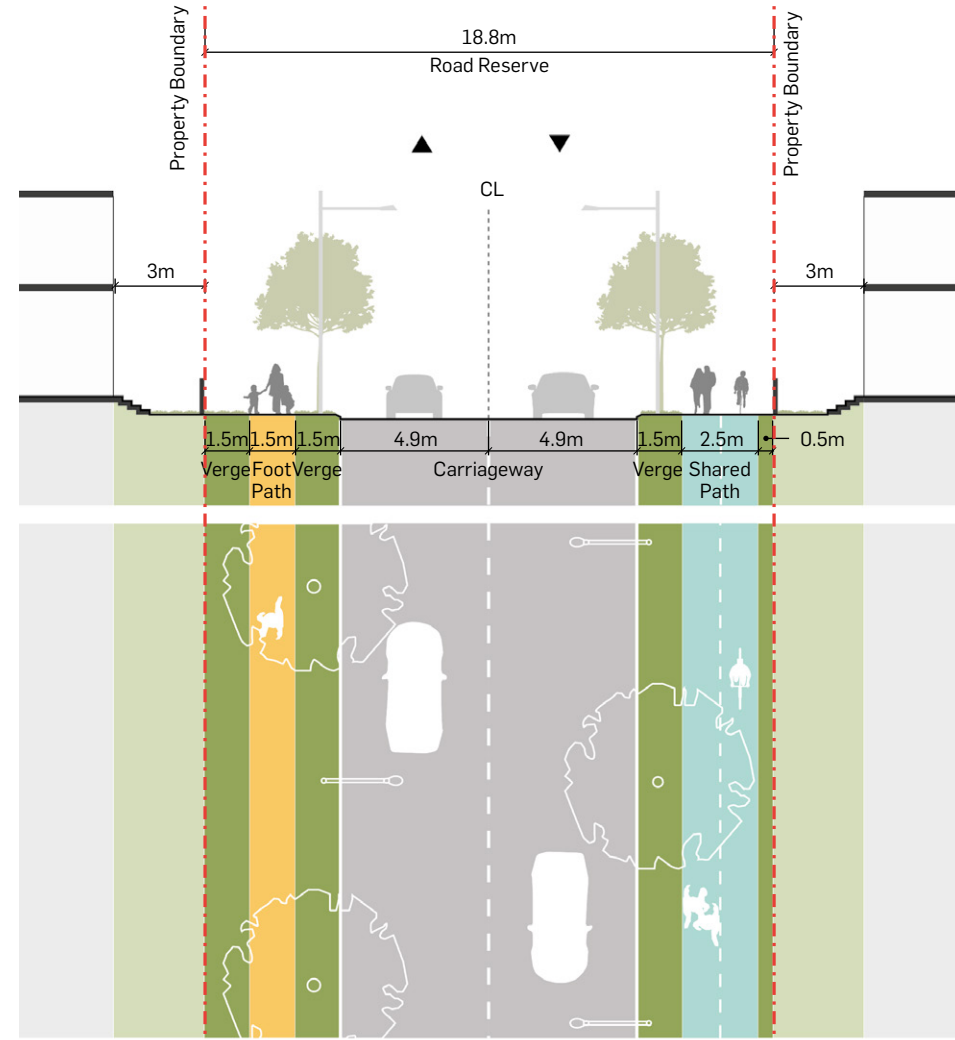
Indicative Street Section D-D' - Local Road - Type 5
